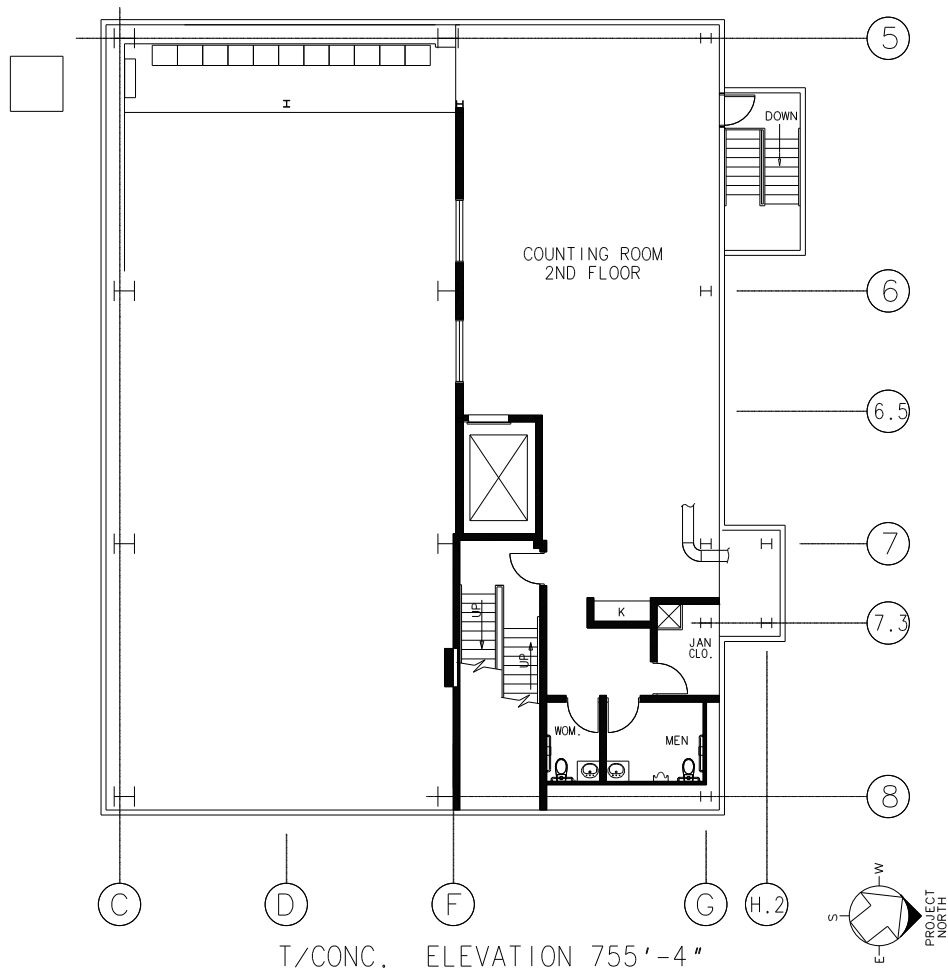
Layout of C0 Counting Rooms: Second floor.
